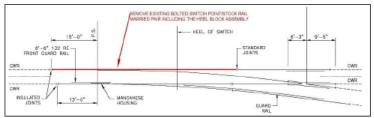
REMOVE SWITCH POINT/STOCK RAIL MARRIED PAIR ON STRAIGHT SIDE
